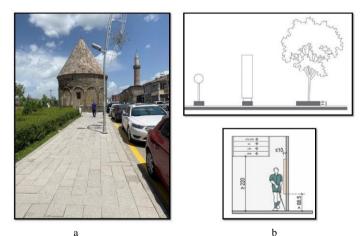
A view around Erzurum Castle, (a: Source; Authors, b:Erişilebilirlik Kılavuzu, (2020)).
